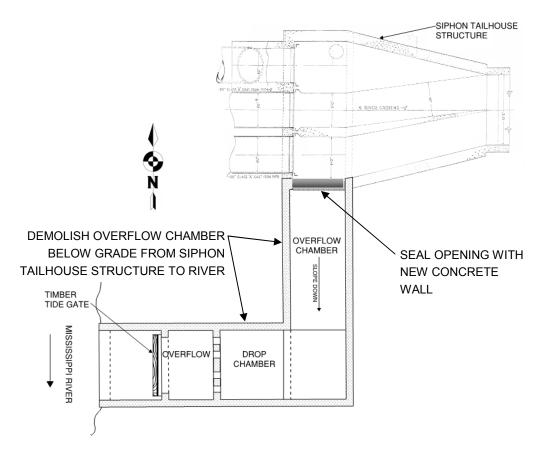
Siphon Tailhouse Chamber Plan View
